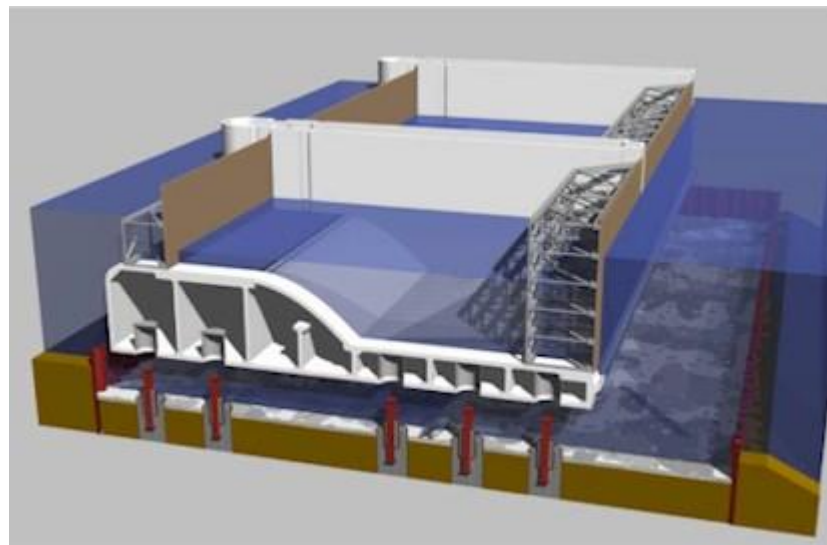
DAM LANDING PRE-INSTALLED CAISSONS
